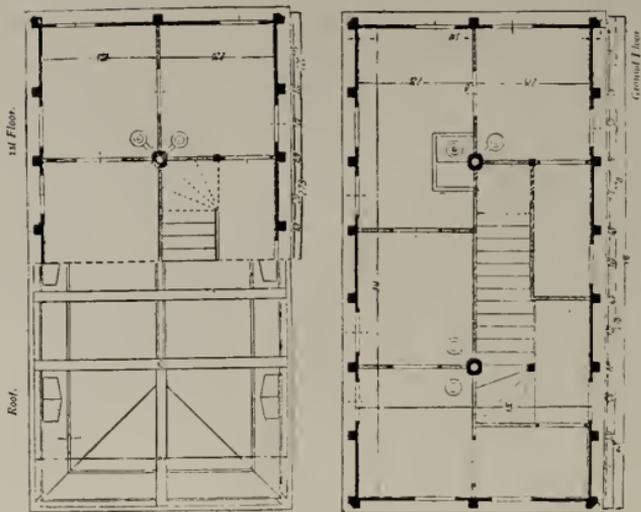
Upper and Lower Floor Plan of Structures Designed to Resist Earthquake
